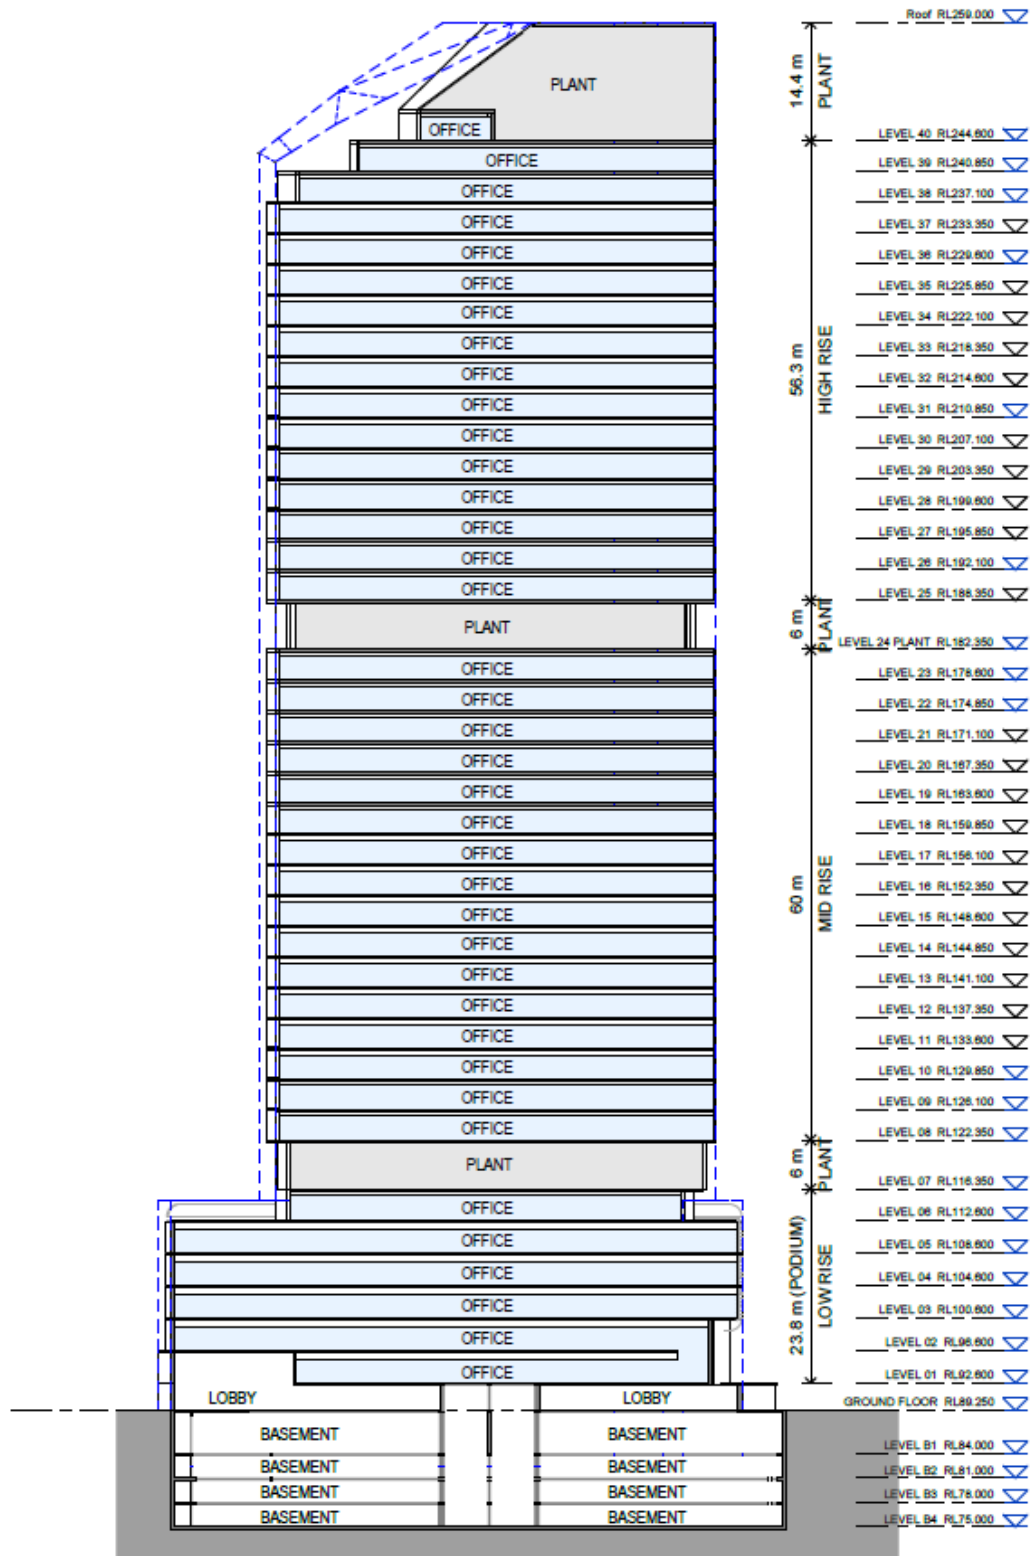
Indicative concept building envelope within the proposed maximum building height control that will apply (RL 259m)
